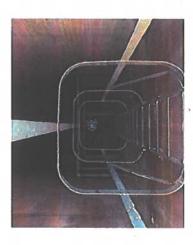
Pevensey Central Outfall - Inner chamber. South Sub-Chamber (Coast Road). Existing access arrangement.
